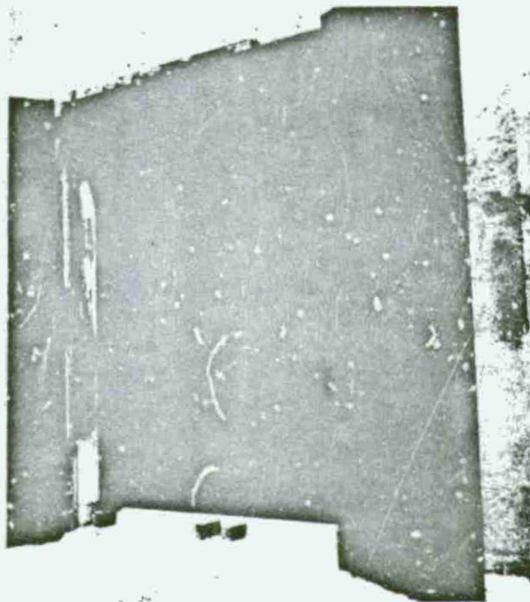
Doorway of Igloo A. Note door construction and door arrestors at top and bottom.
